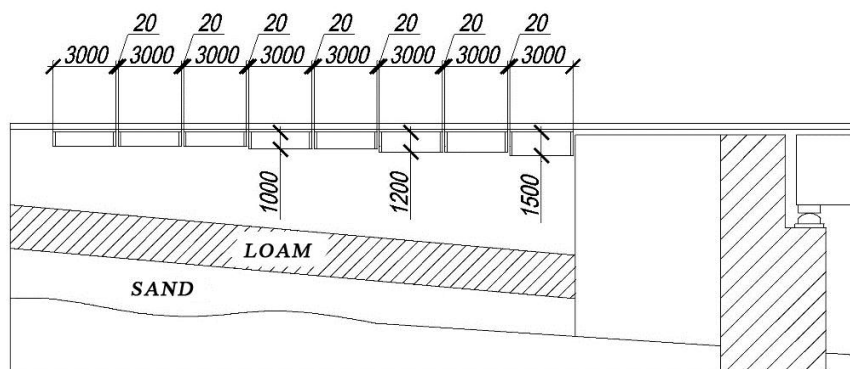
Construction of the transitional area using reinforced concrete boxes
